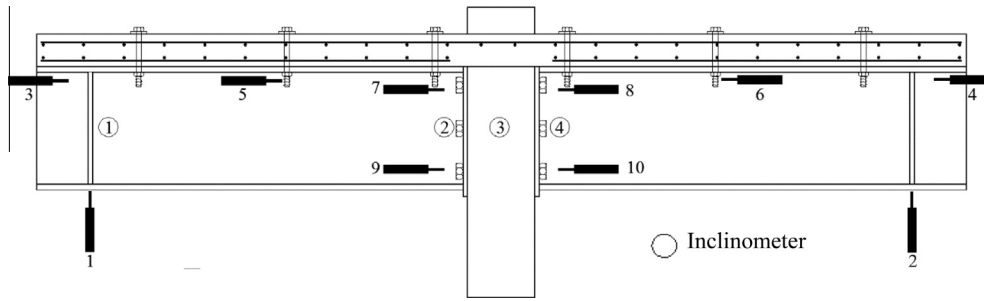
Layout of LSCTs and inclinometers mounted on steel beams and column.
